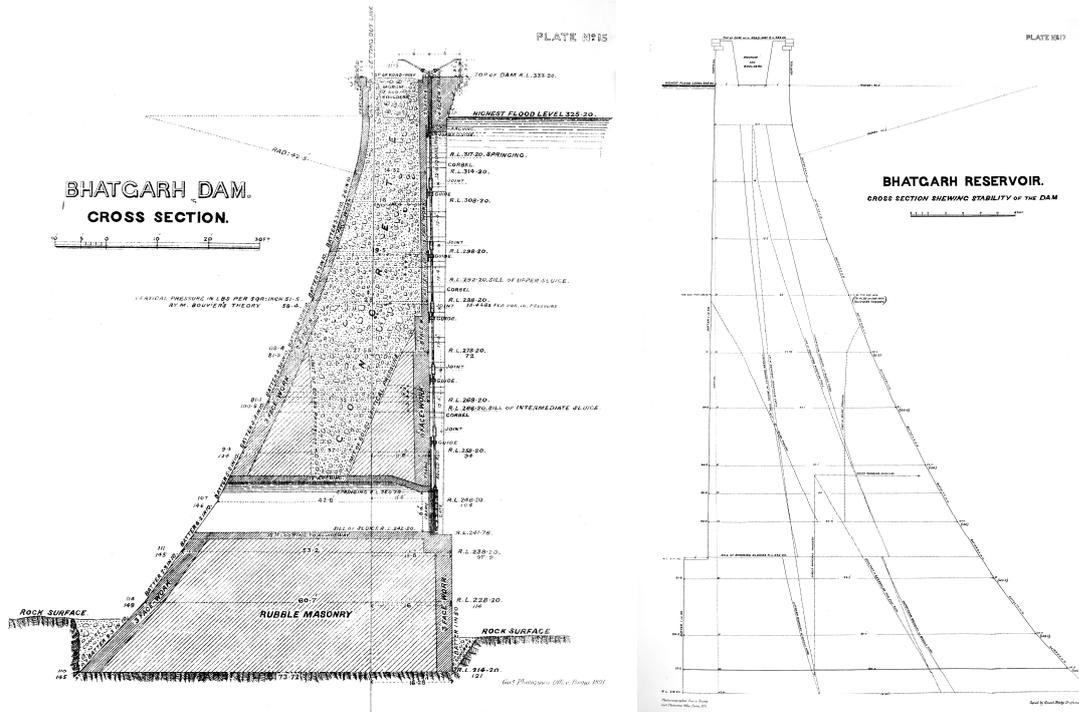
a: Bhatgarh Dam cross-section as built; Figure 4 b: Bhatgarh dam: stability diagram
